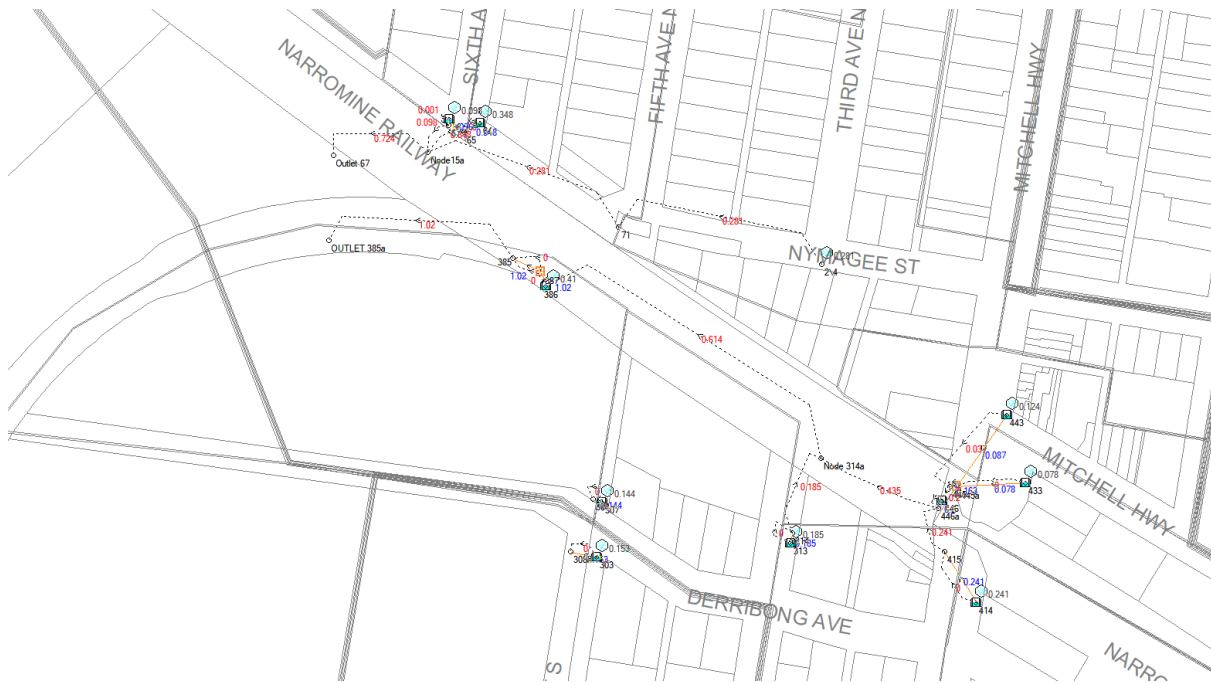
Existing DRAINS 5yr ARI Results (Catchment C5) – Drainage along Nymagee St, Dandaloo St and Derribong Ave
